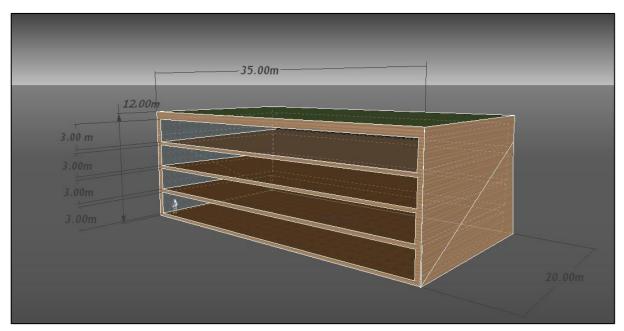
Final 3D drawing of the new Mechanical Engineering Building.
